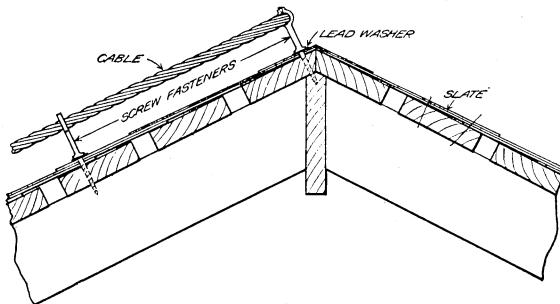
Use of screw fasteners on shingle, metal, or slate roofs. (See fig. 2, C)
